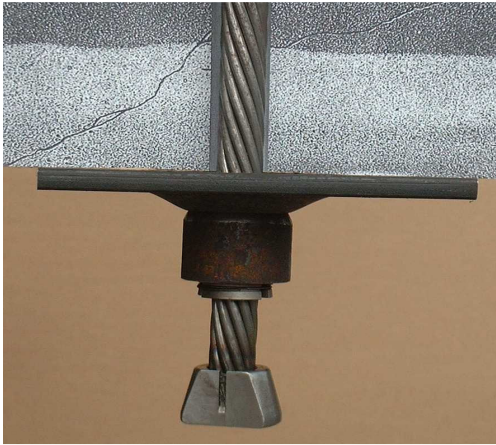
Flexibolt Pre-Tension – Nut and Locker
